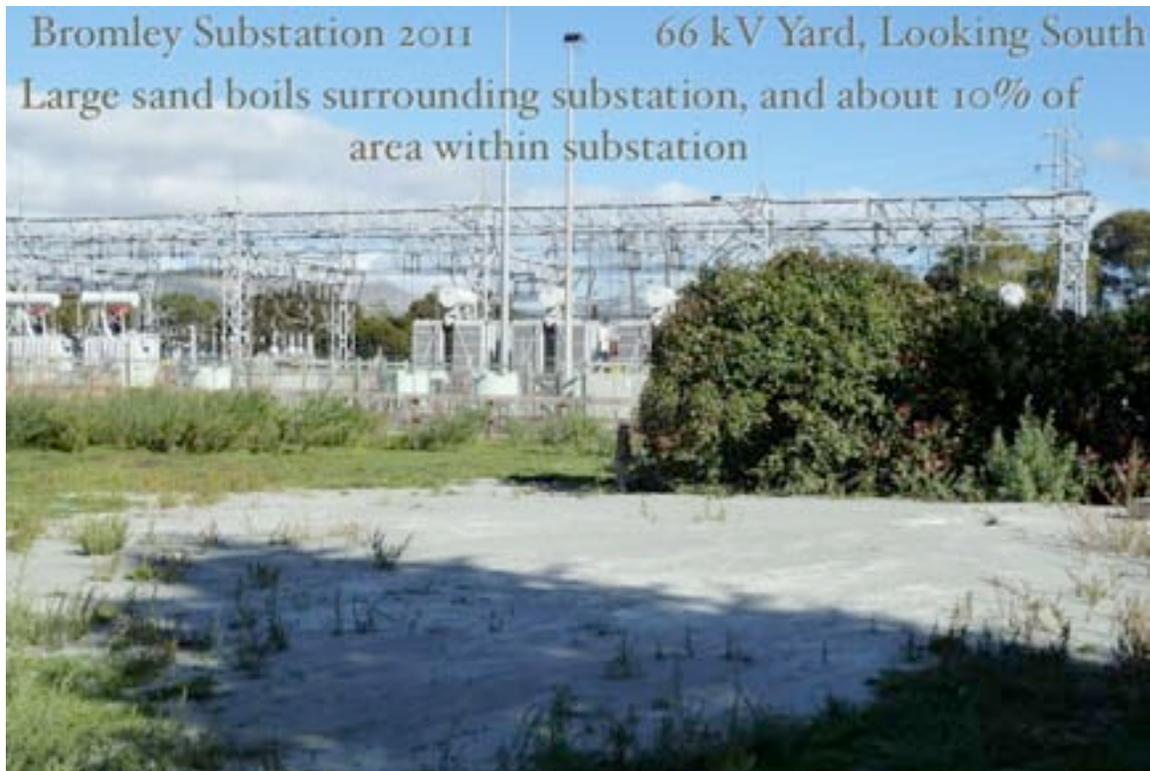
Liquefaction Outside the 66 kV Yard, Bromley Substation
